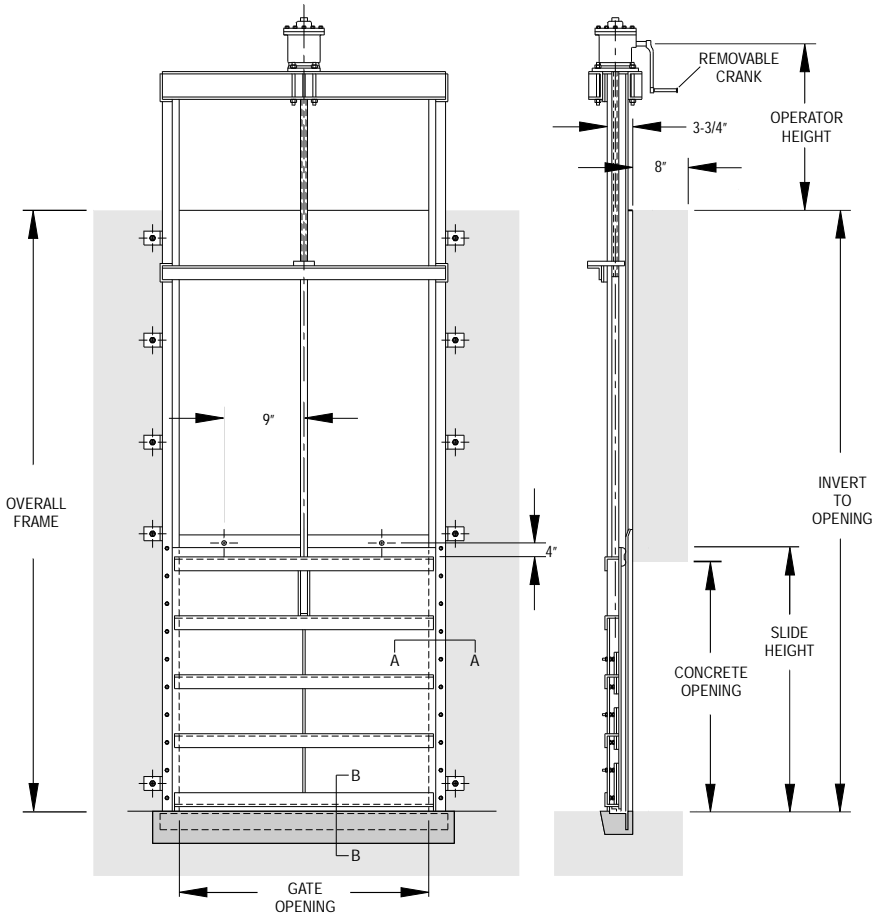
Series 663- Stainless Steel End-of-Channel Mounting with crown Seal; SectionAA
